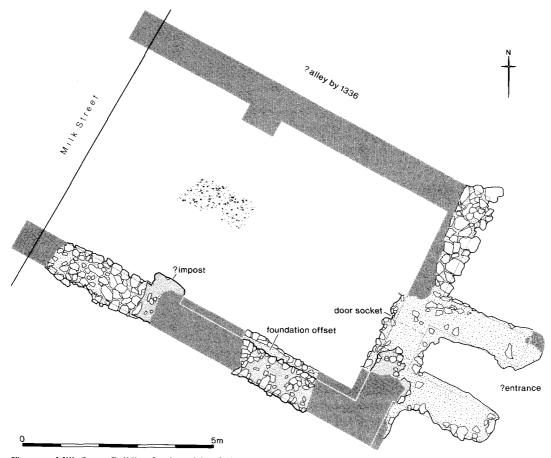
Milk Street: Building 6, plan of foundations and walling (1:100).
